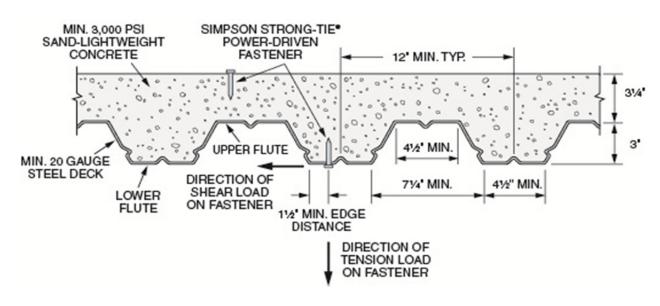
INSTALLATION IN CONCRETE FILL OVER STEEL DECK
